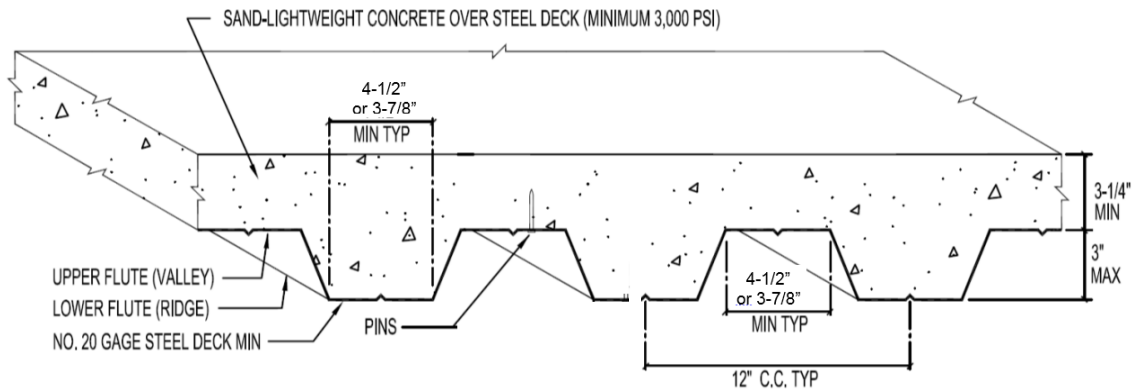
C—CONFIGURATION OF CONCRETE FILLED 3-INCH DEEP STEEL DECK (UPPER FLUTE INSTALLATIONS)
